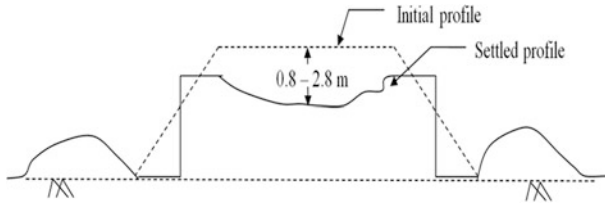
Failure of approach embankment of Gramenchira Bridge
